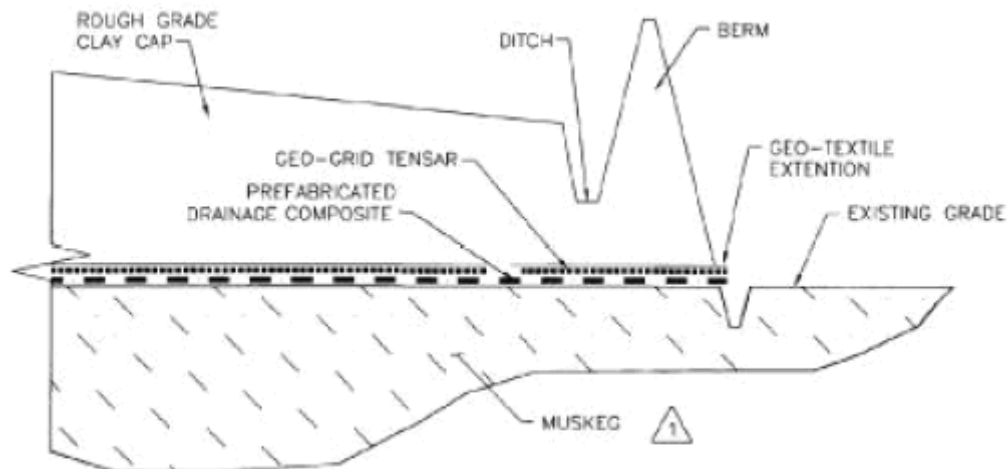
Cross-section of a floating well pad constructed on a peatland (Opti Canada & Nexen 2006).
